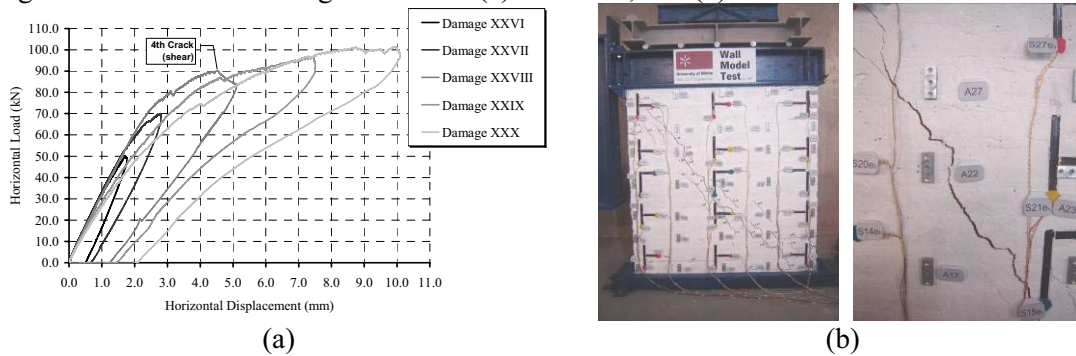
Wall model damage scenarios: (a) static test; and (b) one crack with 1.20 mm width
